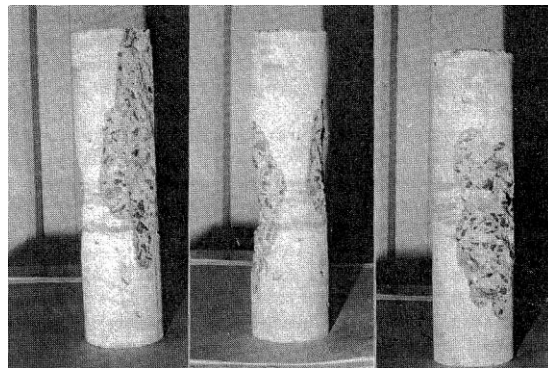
Destructive spalling of Lt-concrete specimens loaded during heating [48].
